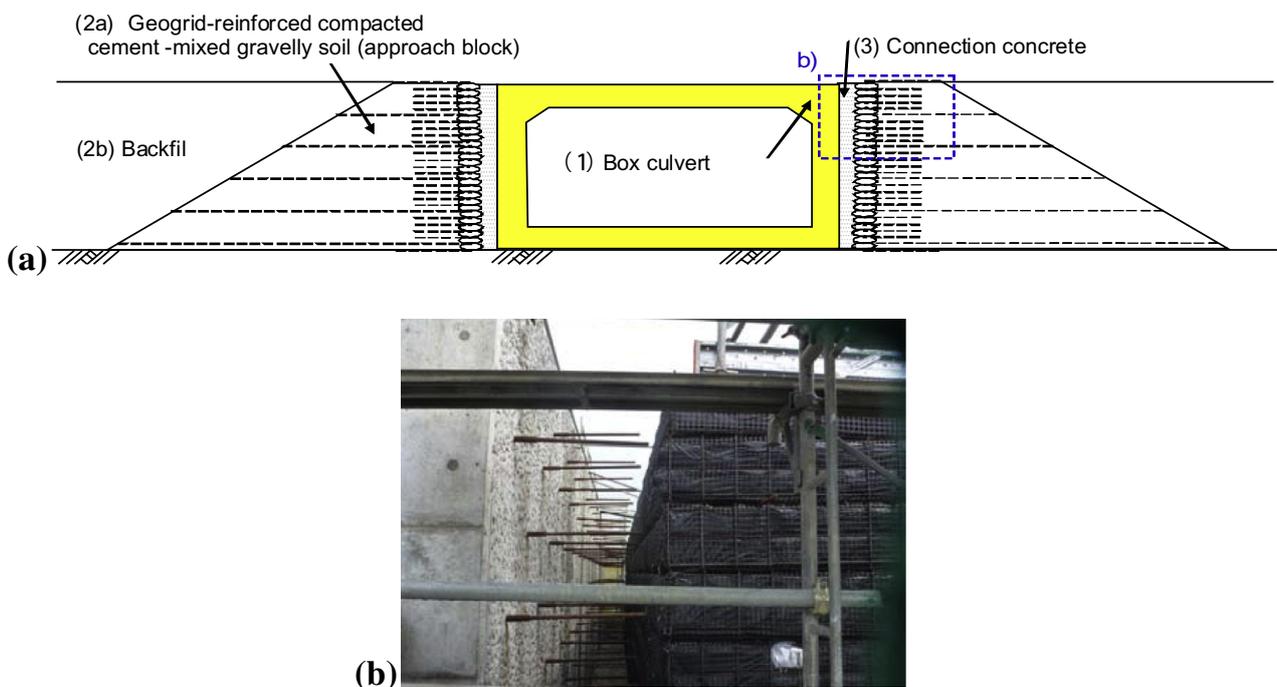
GRS culvert box (site B2): (a) general structure; the numbers show the construction sequence; and (b) a space between the RC box structure and the approach block before step (3) (at site B1).
